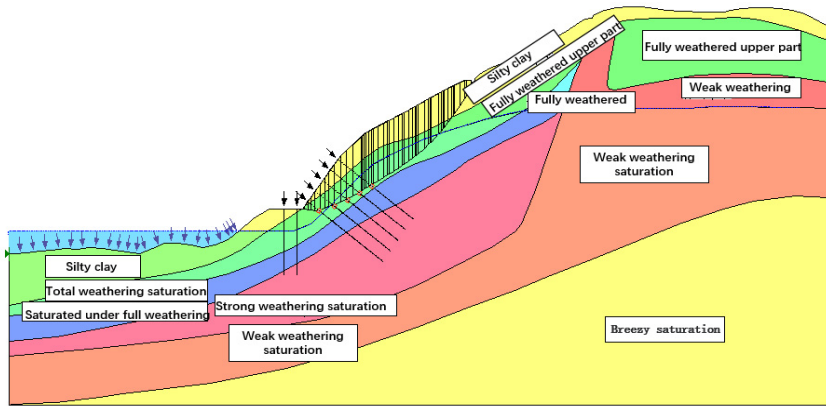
Schematic diagram of artificial slope sliding surface at the entrance of traffic tunnel (reinforcement measures for artificial slope - rainstorm condition)
